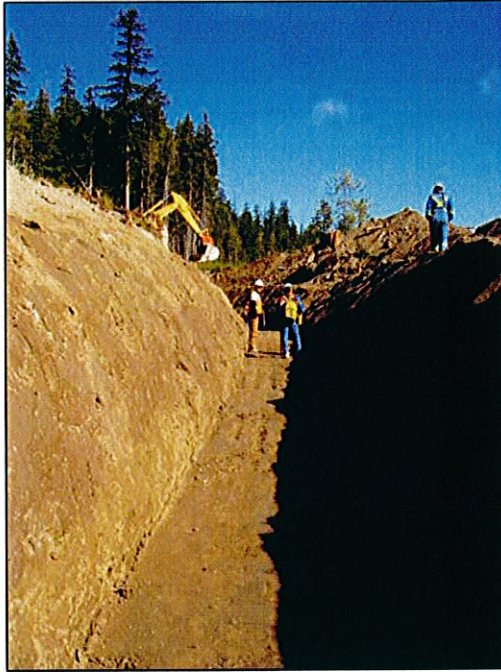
Placement of Zone S material on the South Embankment, the last section to be brought up to elevation 951 m with Zone S.
